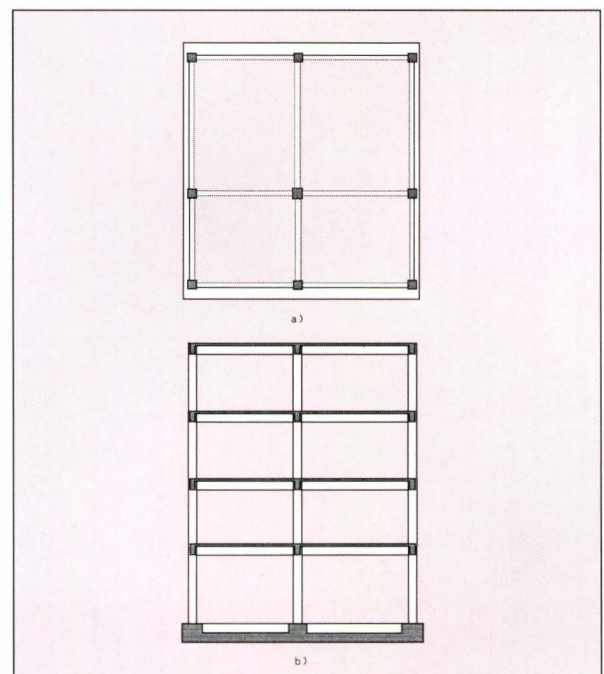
4-Storey reinforced concrete frame to be tested in ELSA: a) plan, b) elevation
